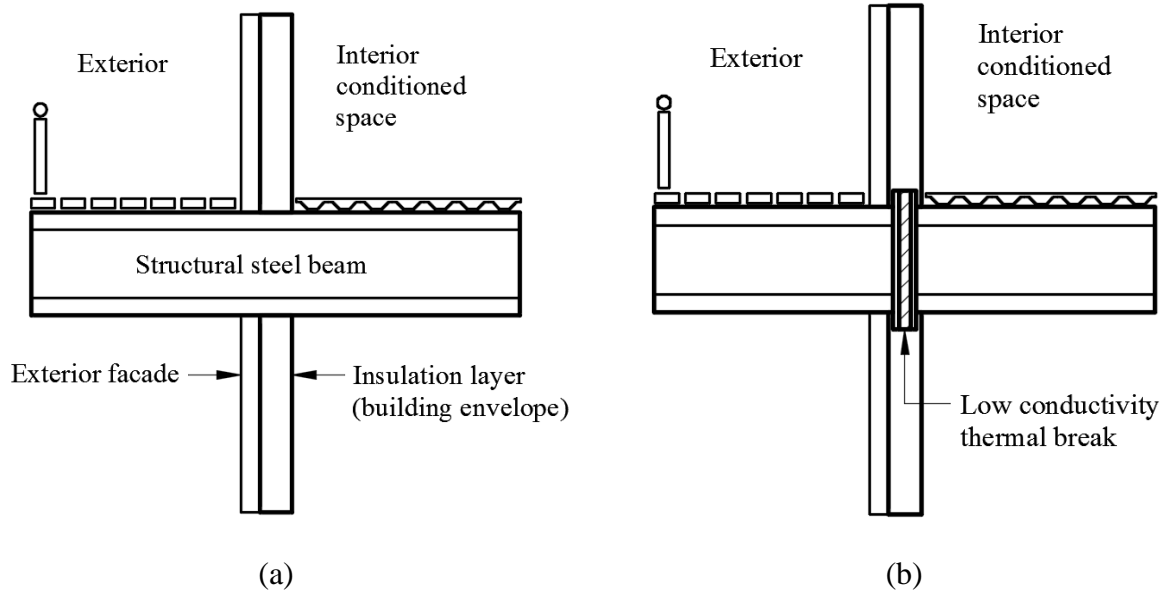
Example of a structural steel (a) thermal bridge and (b) thermal break
